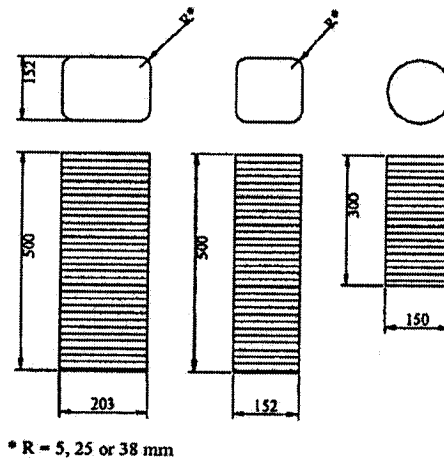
Column dimensions (Rochette and Labossiere 2000).
